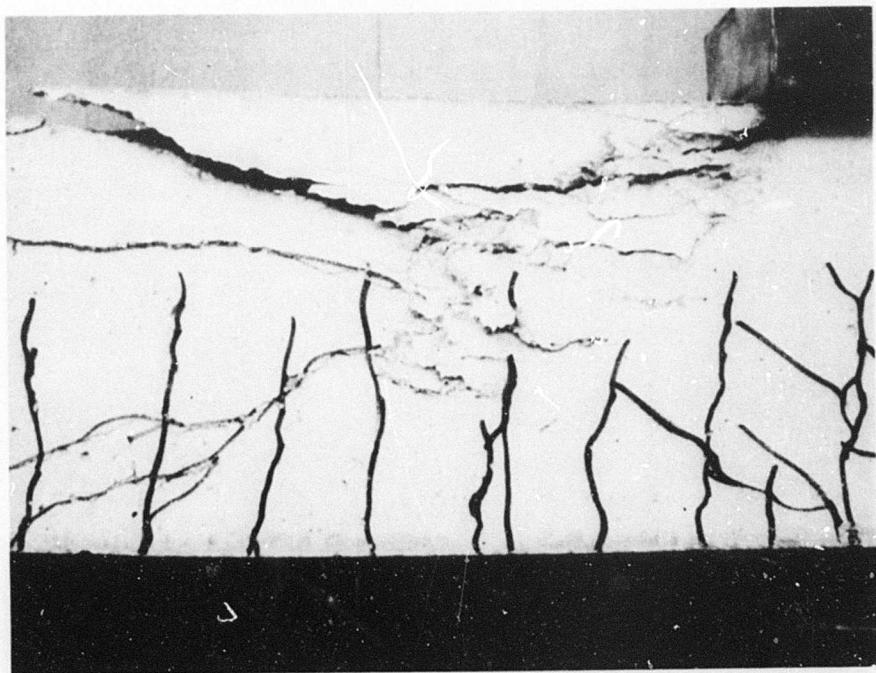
Crack pattern, beam CW2 (1 of 2 sheets)
